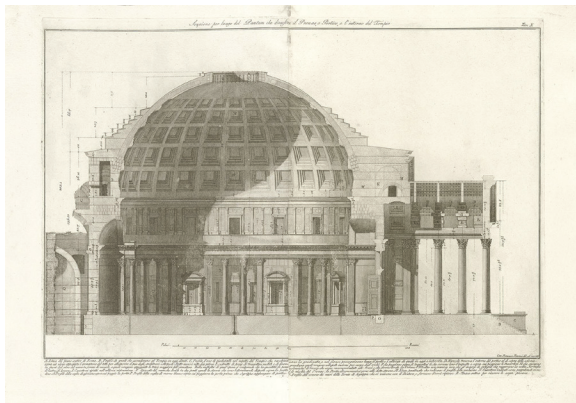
\ Piranesi's longitudinal section, a stunning example of typical architectural analysis and precedent.
